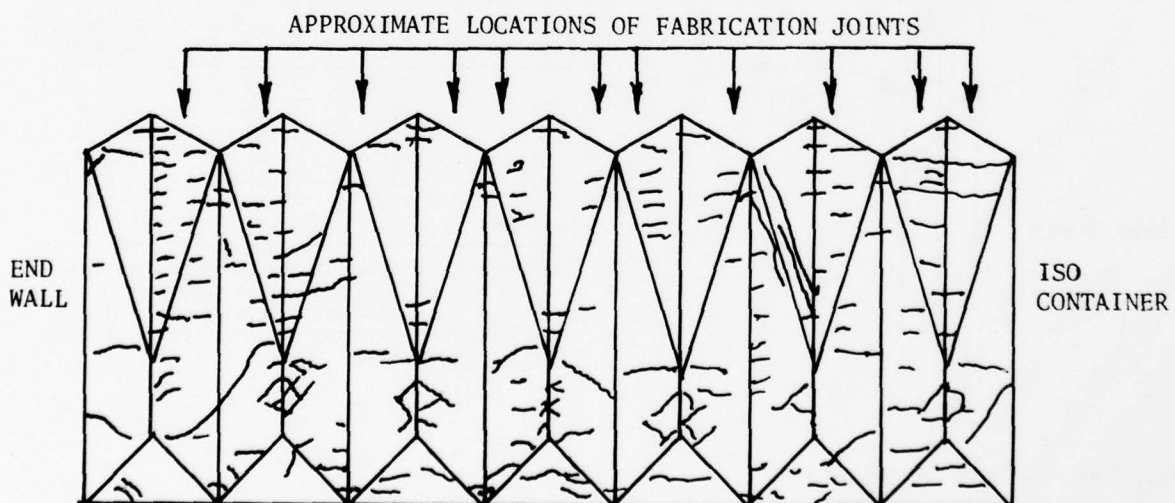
Sketch of skin wrinkle patterns on left side wall as viewed from inside shelter.
